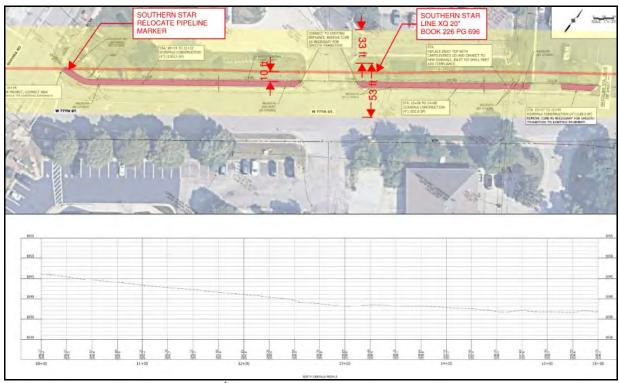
77th STREET SIDEWAK GAP PROJECT
